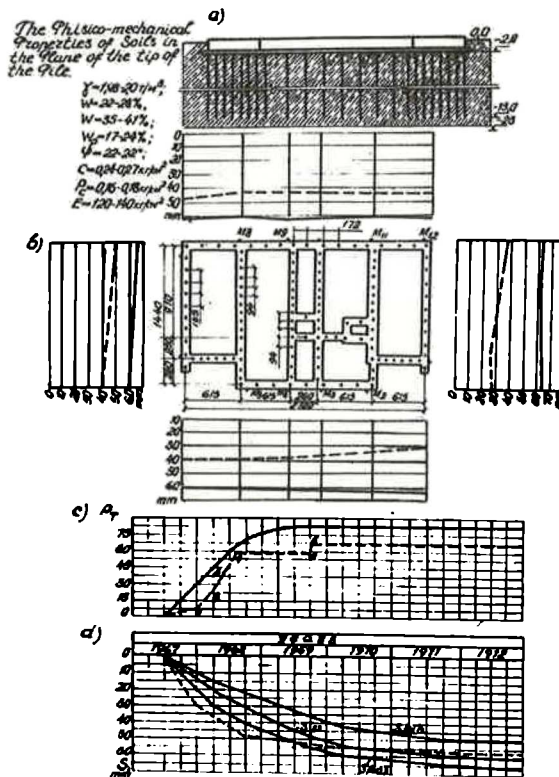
Results Settlement Observations of nine-story building, the type 1-P-447C-25/65. a) vertical section; b) plan of the foundation and the settlement of sings - - - settlements for the period of construction, - the same for the period of observation; c) the chart of an average rate of the load on pile - - - designed load, - - - actual load on pile according to the data of measurements with the help of tensometric hoops; d) the chart of settlement time dependence - - - maximum, average and minimum settlement of sings, - - - time dependence of the designed settlement of foundation
